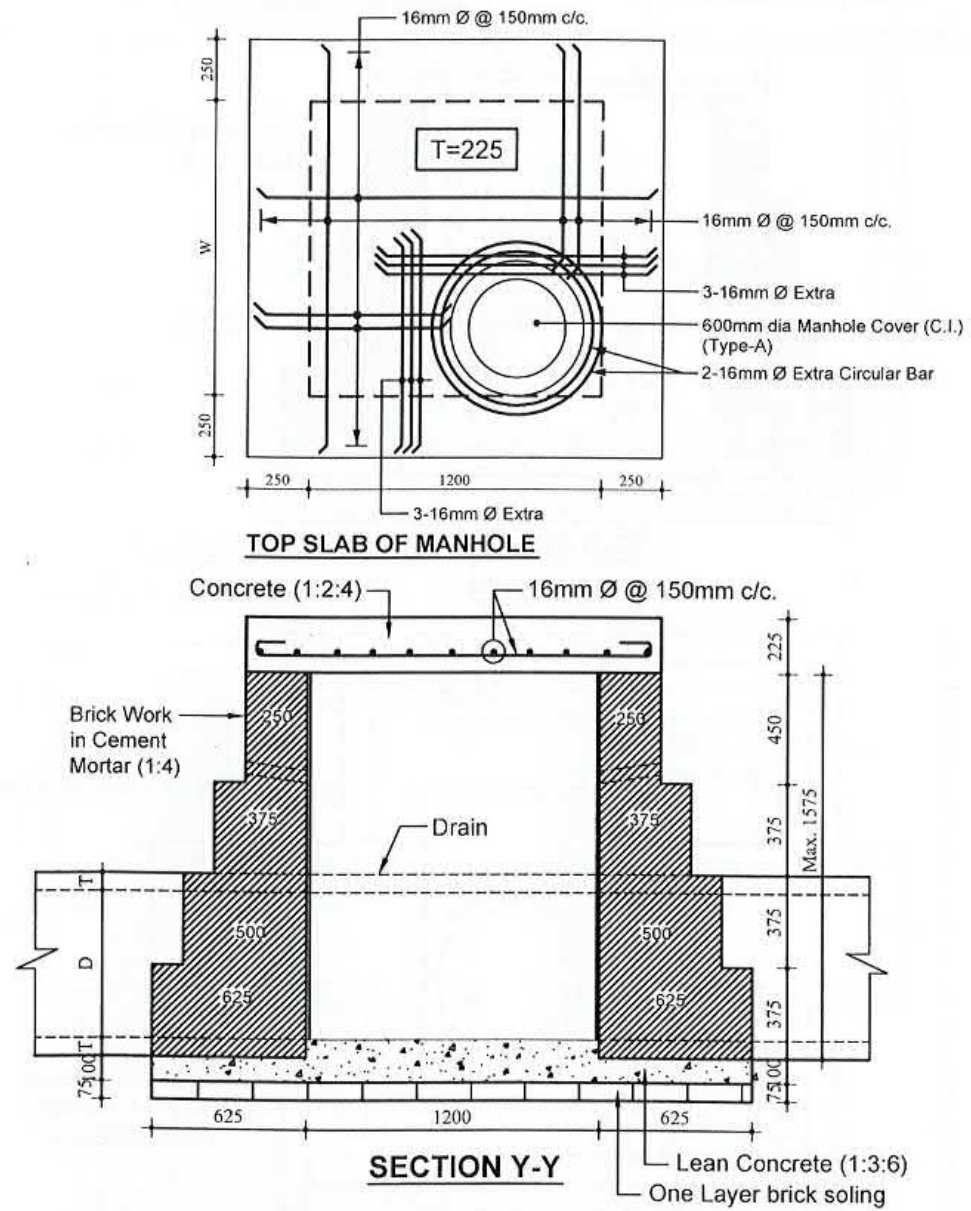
DETAILS OF BRICK MANHOLE FOR ROAD SIDE PIPE DRAIN
